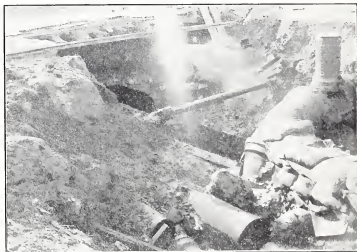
Scene Corner of Howard and Seventeenth Streets Showing Rupture of Car Tracks, Sewer, Water and Gas Pipes.
